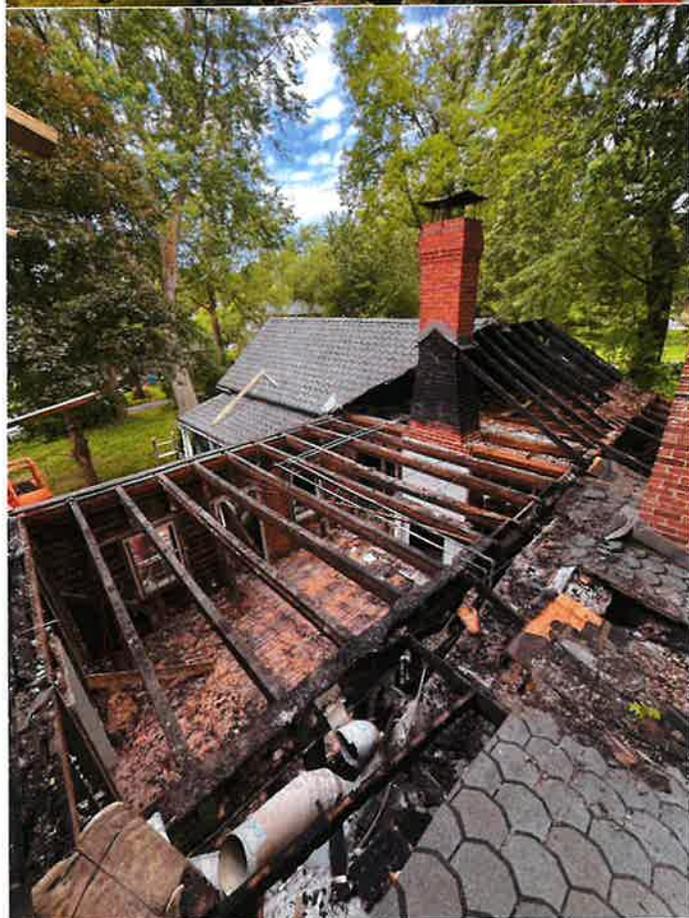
Exhibit C: Existing Conditions & Sketch for 2nd Floor addition
